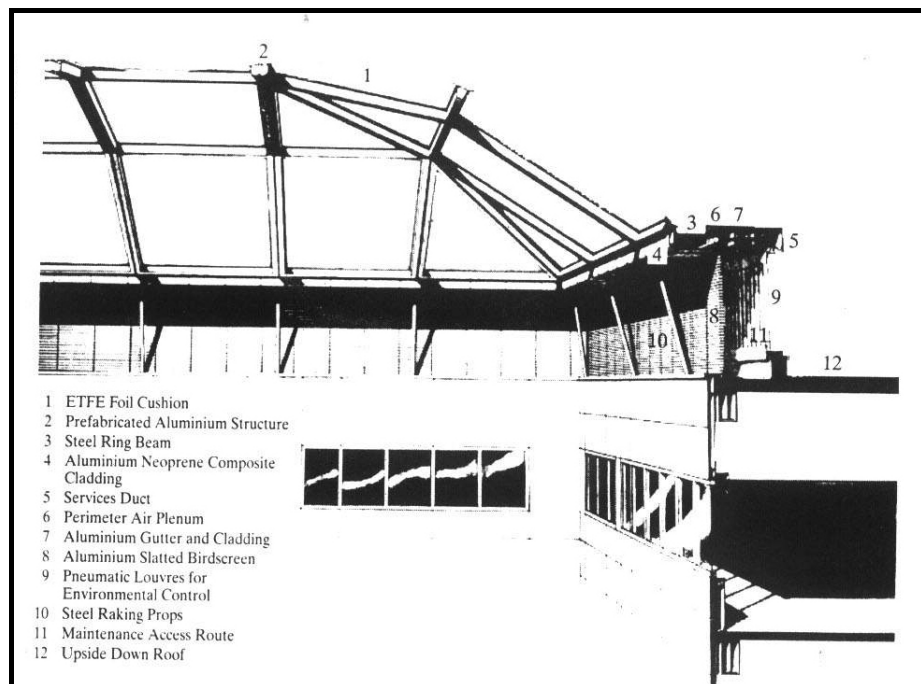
15. Section Drawing Showing Components Of Atrium Roof
